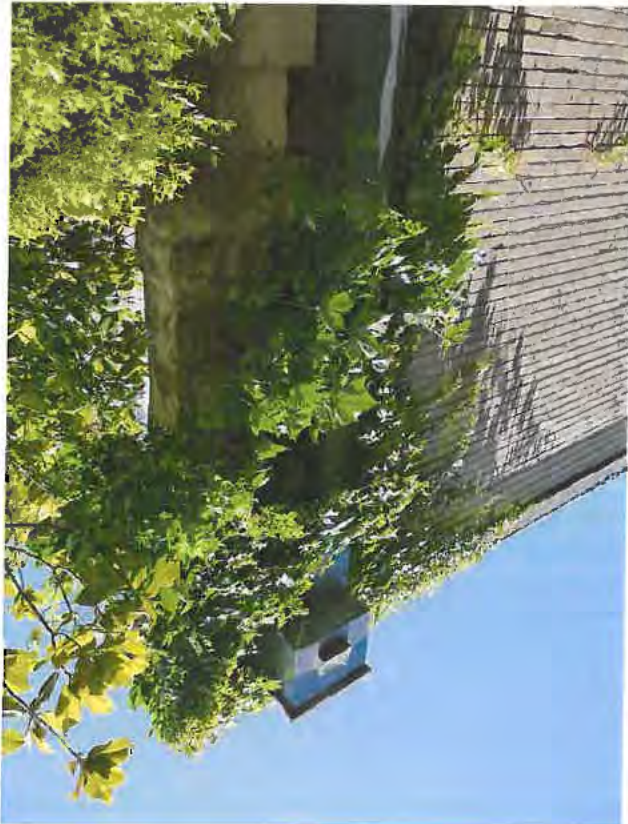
Vines growing on the south wall of the Chateau Room should be removed to prevent them from damaging roof flashings and clogging conductors and downspouts.
